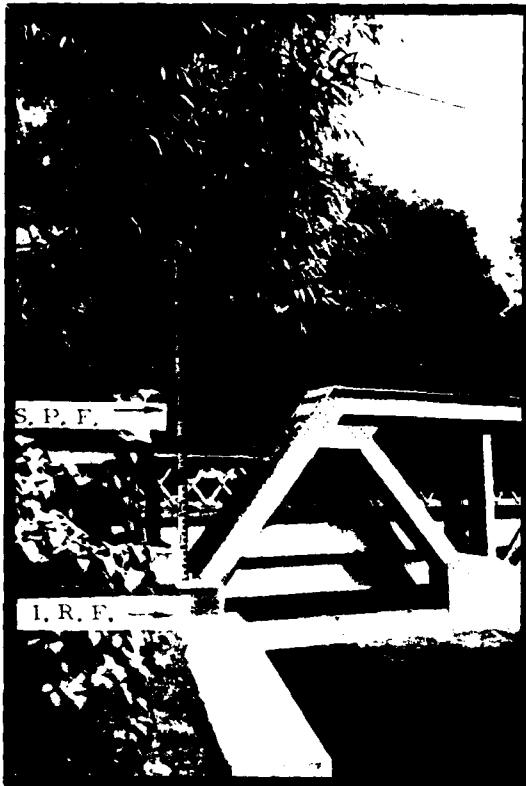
Shows Standard Project Flood and Intermediate Regional Flood heights at Pavement Road bridge, mile 23.11, in the Town of Lancaster.
